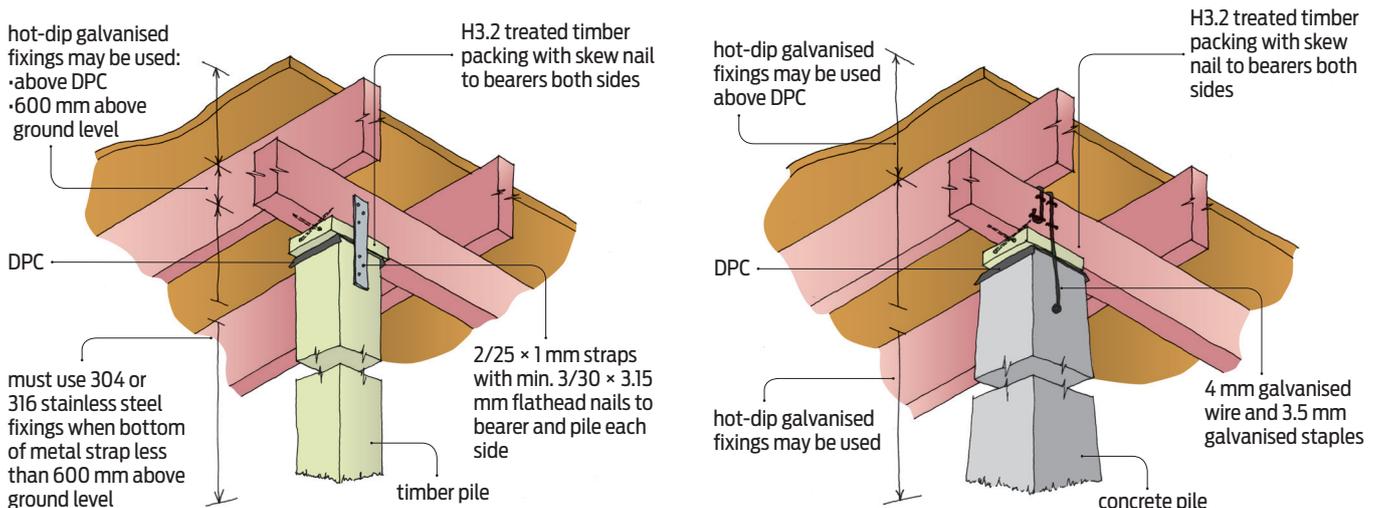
Jack and pack repair – timber pile (left) and concrete pile (right).
